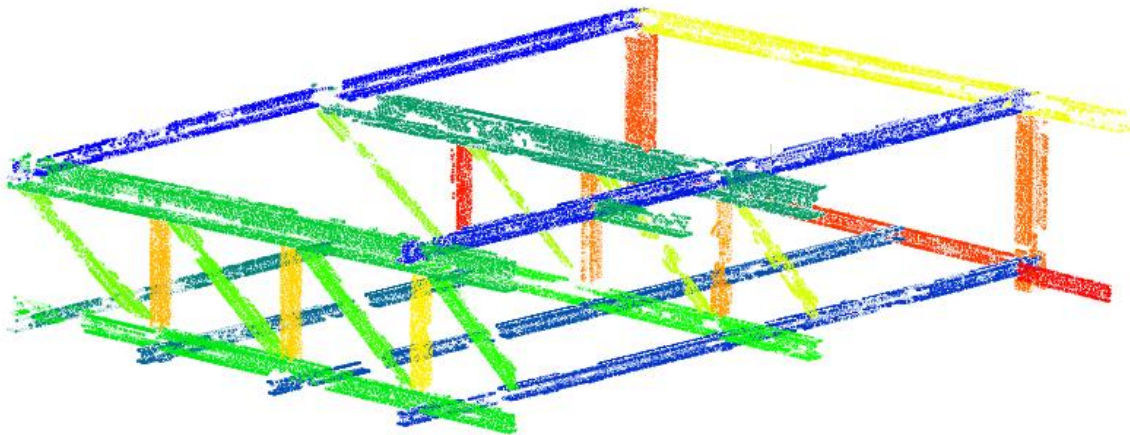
Steel roof structure point cloud, ground truth beam instances color-coded.
